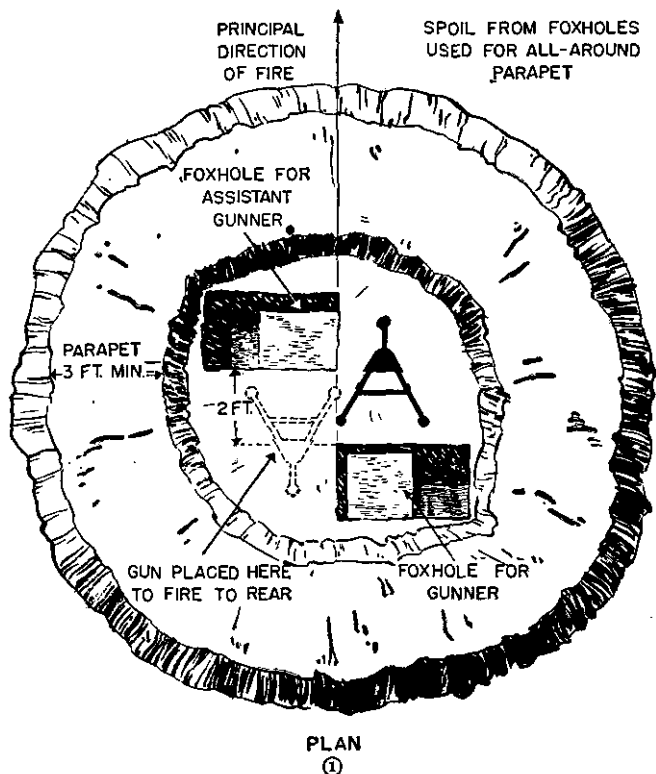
Two-foxhole type emplacement for caliber .30 machine gun (light). (Camouflage omitted.)
